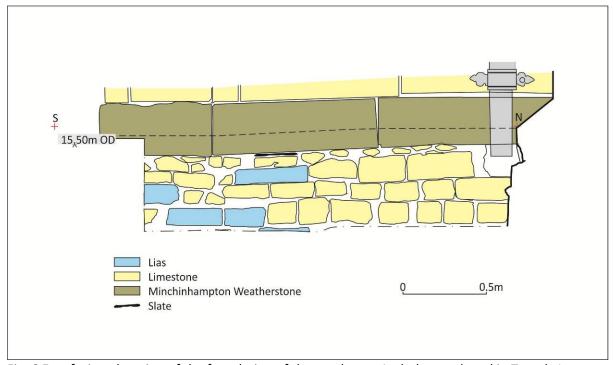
East facing elevation of the foundation of the southwest Ambulatory chapel in Trench 1
